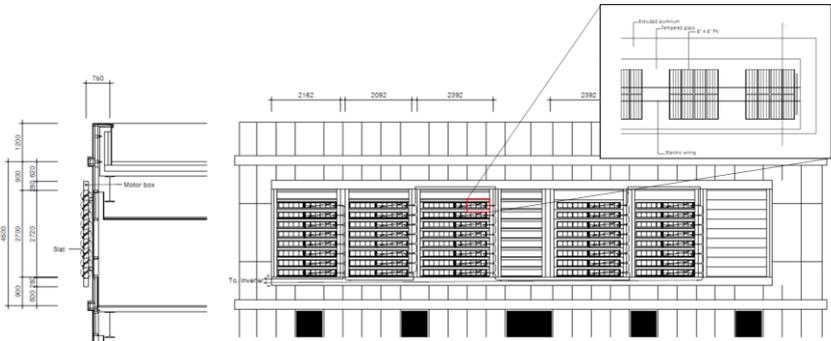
Section and enlarged elevation of the lower-type BIPV
